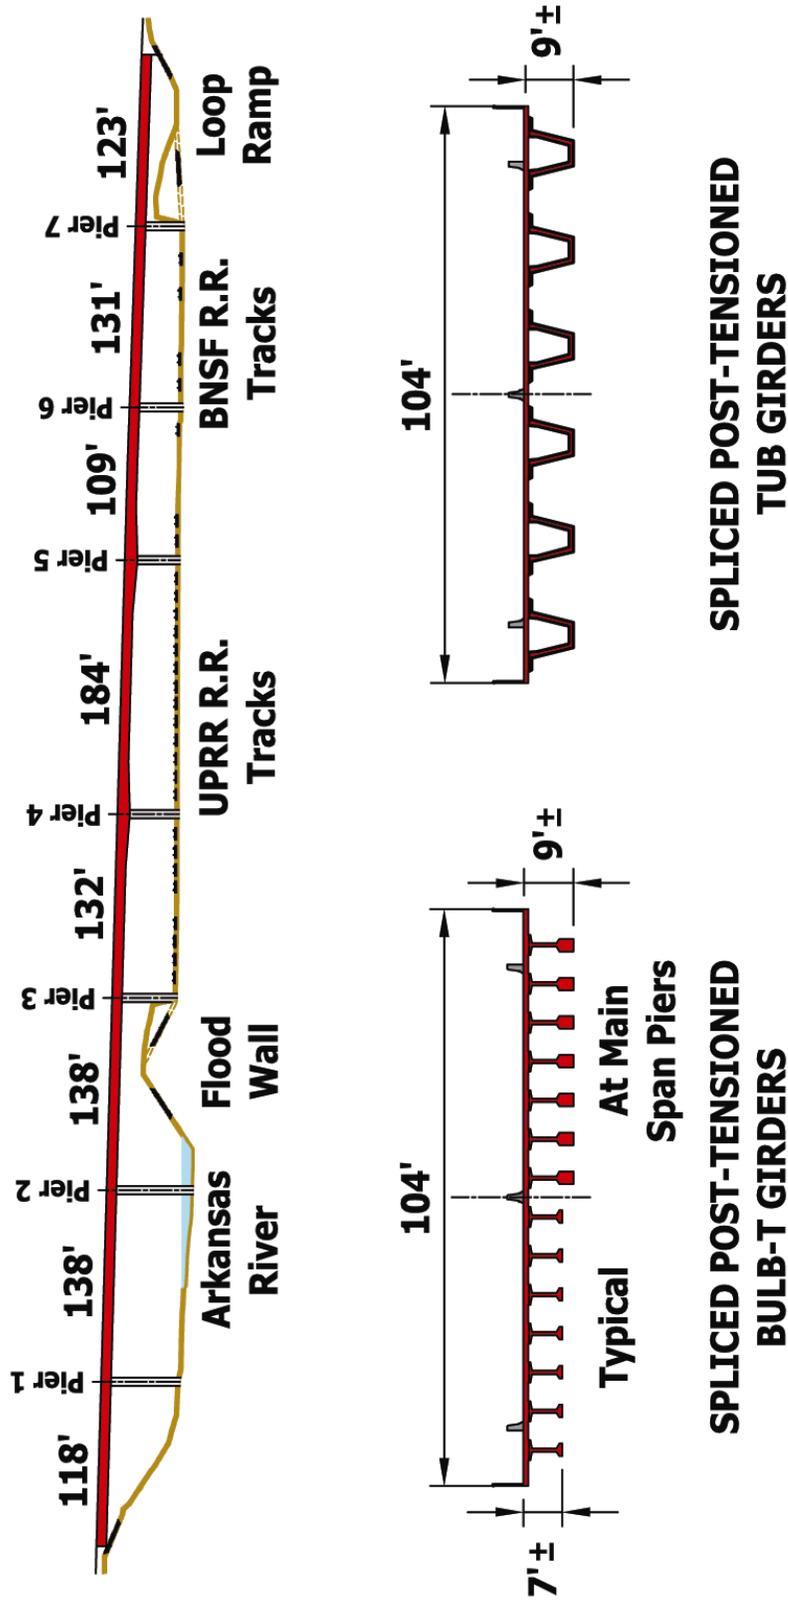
Match Existing RR Spans w/ Modified River Spans - Elevation
